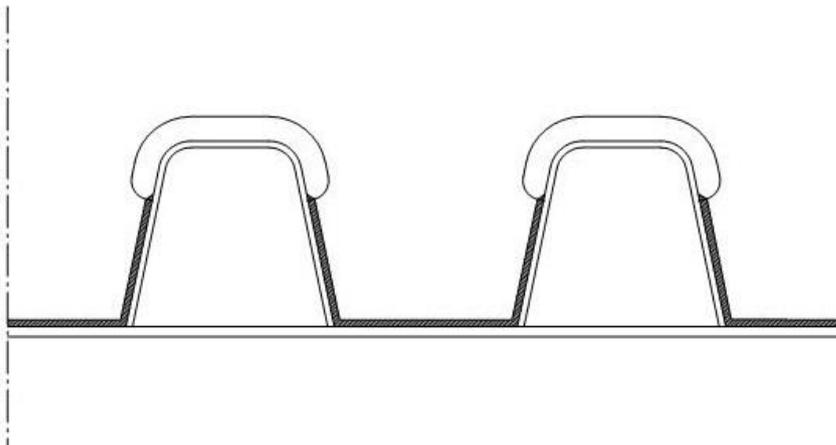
Fillet welds between diaphragms/stiffeners, troughs and deck are an obvious case for robotic welding
